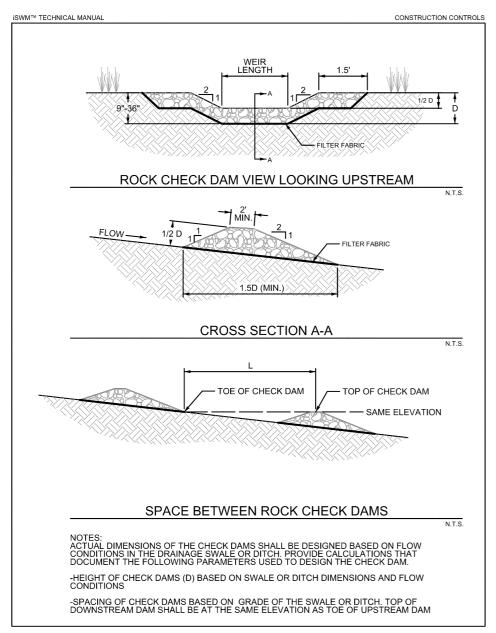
STANDARD CONSTRUCTION DETAIL - ROCK CHECK DAMS (1 OF 2)
